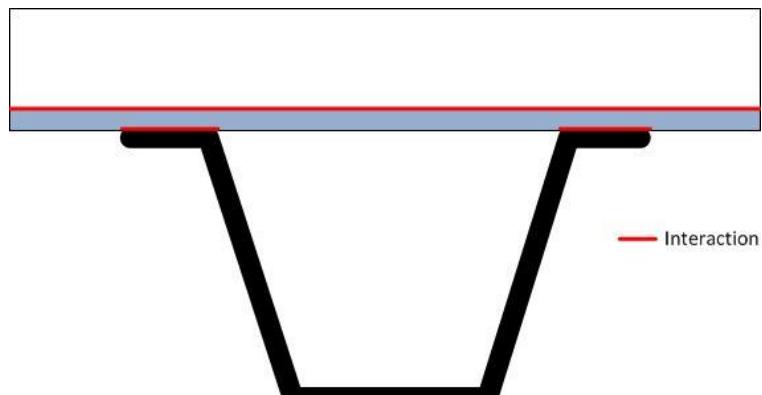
Interaction between ASSET deck and top plate and the top plate and top flange of GFRP girders
